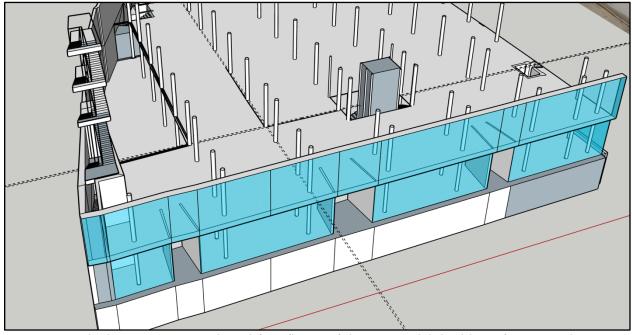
The basement, ground, and first floors of the new Walsh building, facing High Street. The front of the building featured large plate glass windows on the ground and first floors. This model has one light well placed, on the left, with the employee staircase next to it. You can also see the main customer elevator and staircase at the center.
